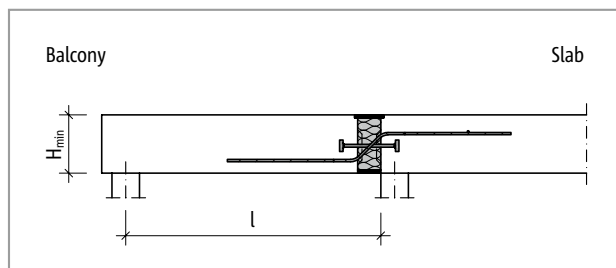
Schöck Isokorb® T type Q-P: Static system
